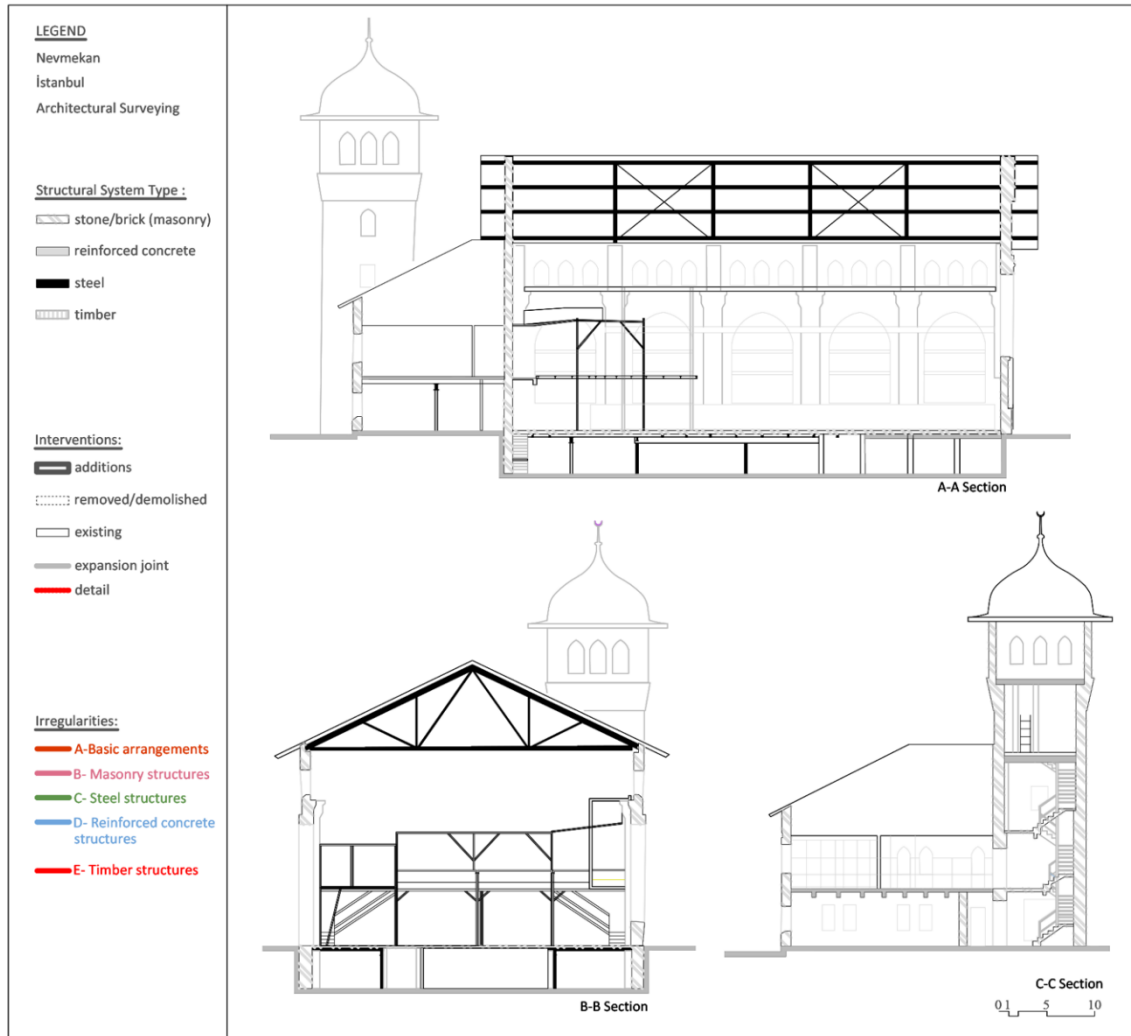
Architectural surveying sections of Üsküdar Electricity Factory (Adapted from Köroğlu, 2019)
